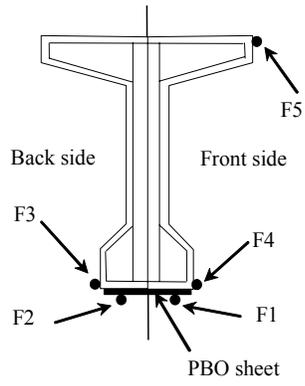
Installation position of fiber optic sensor on the cross section of strengthened PC girder.
